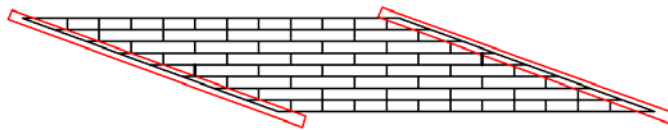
Beneficial Staggered Diaphragm or Cross-Frame Framing Arrangement for a Straight Bridge with Parallel Skew
